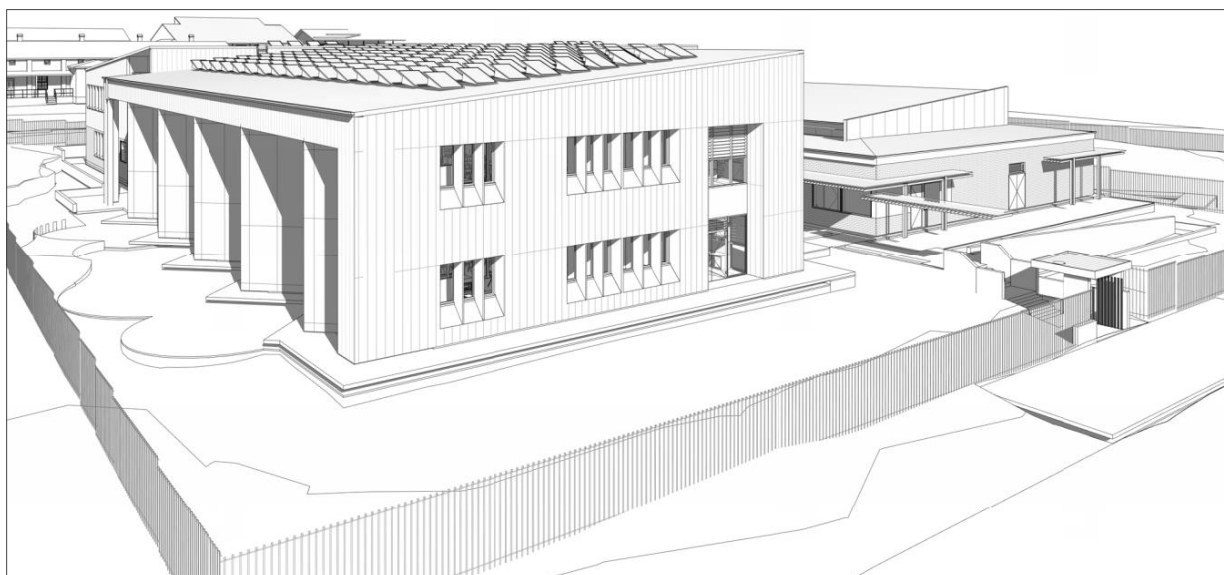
3D perspective view of the proposed school building – north-eastern view. (Source: Conrad Gargett)
